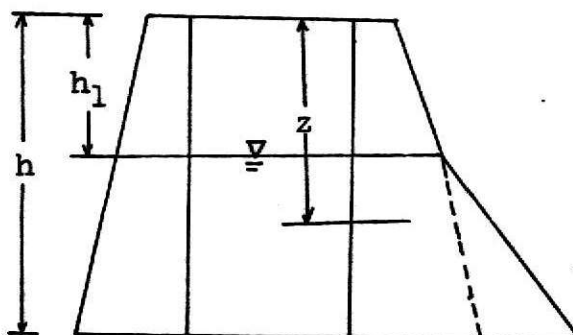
Retaining wall with vertical back and partly submerged backfill
